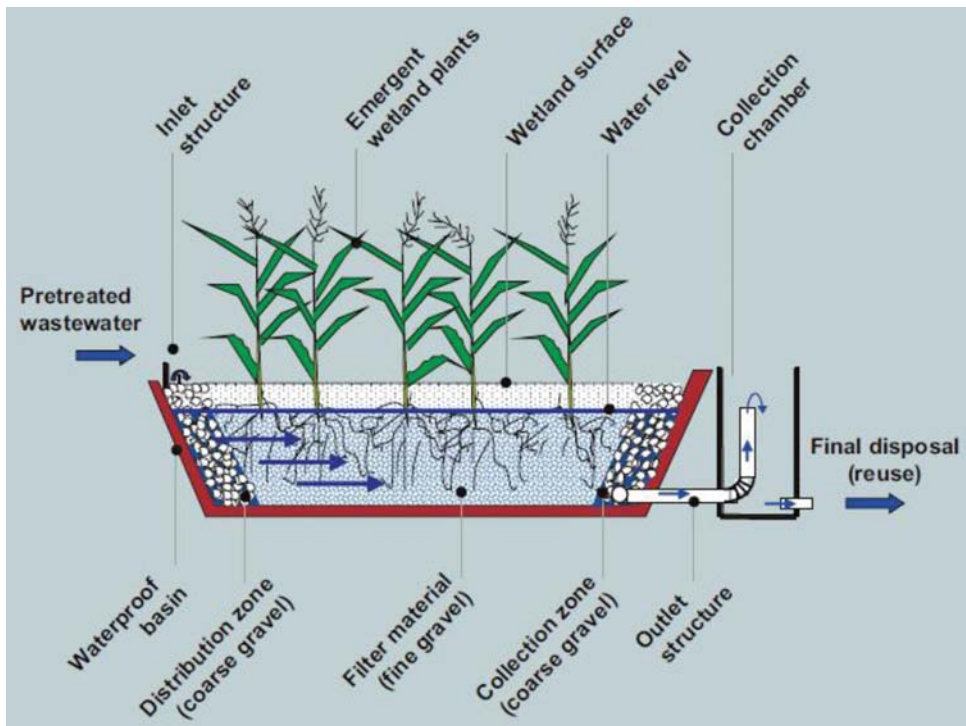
Section of a horizontal flow constructed wetland (adapted from WSP, 2008)
